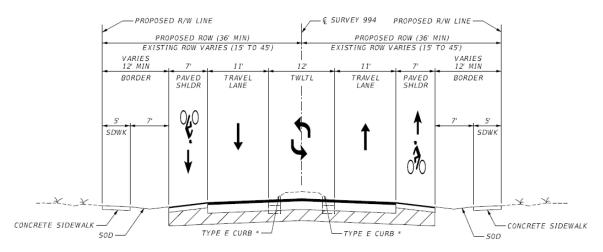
Two-Lane Road with TWLTL and Paved Shoulders
